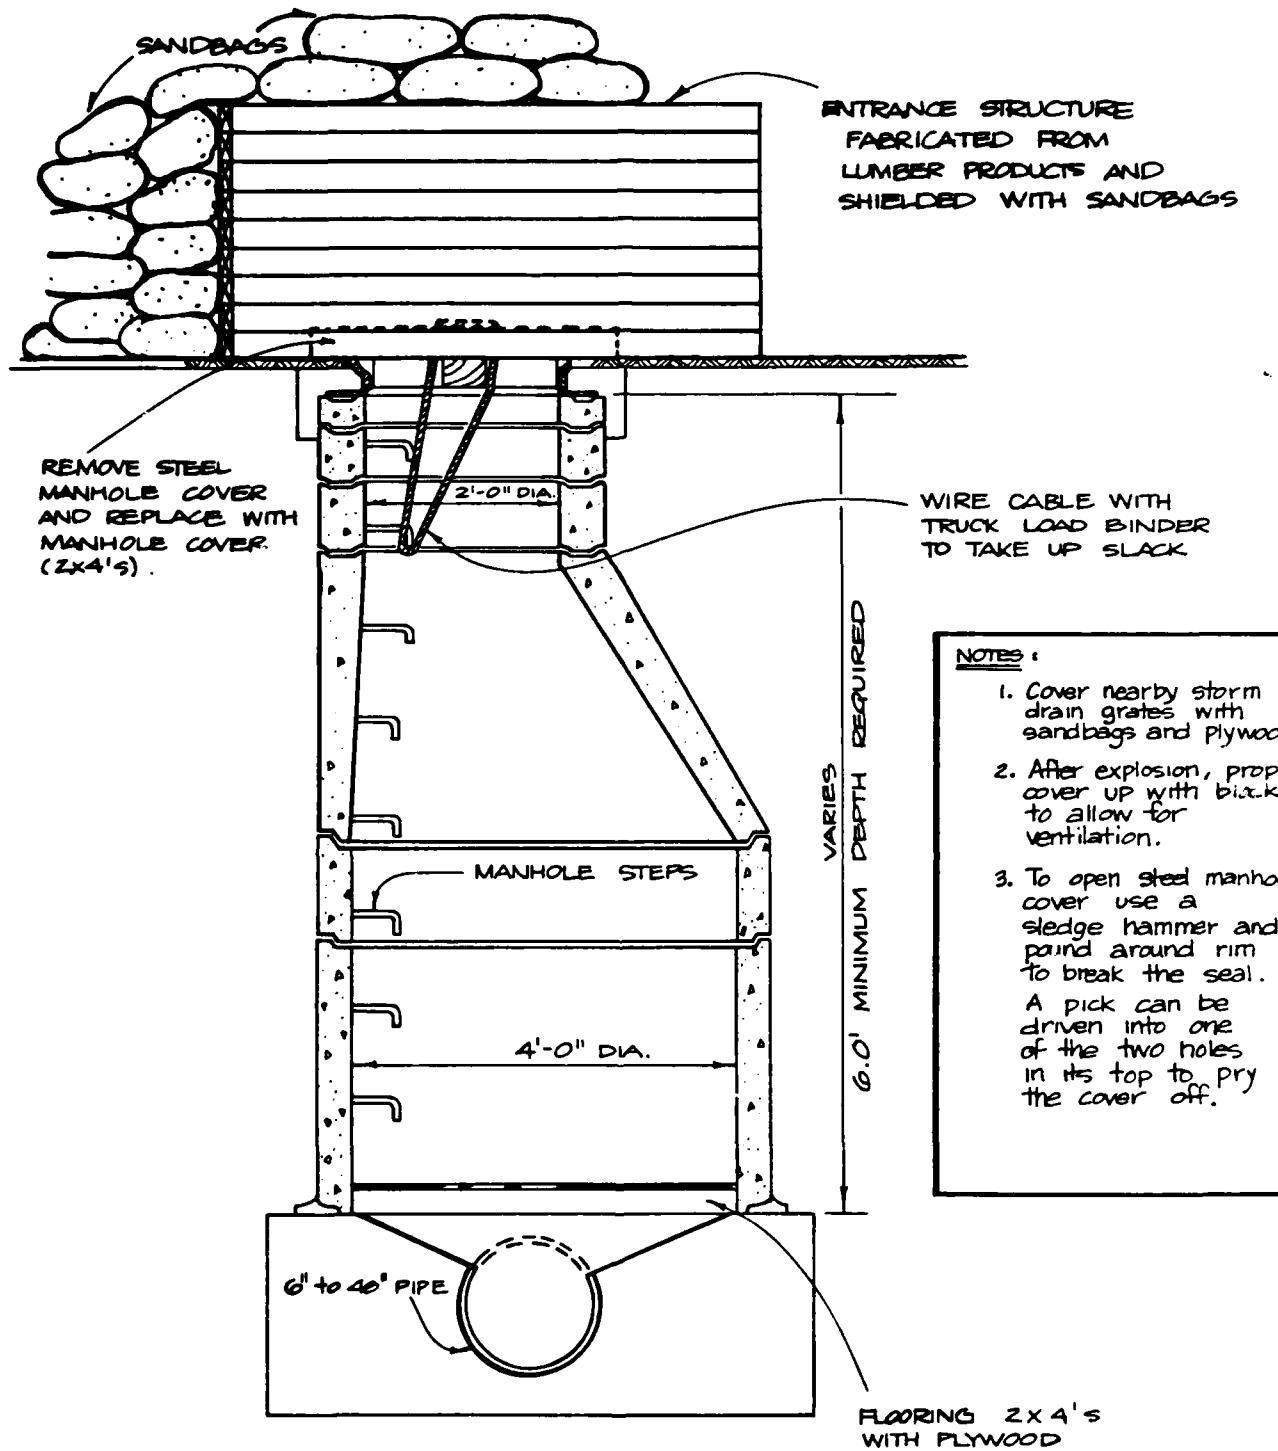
Key Worker Shelter in Storm Manhole.
